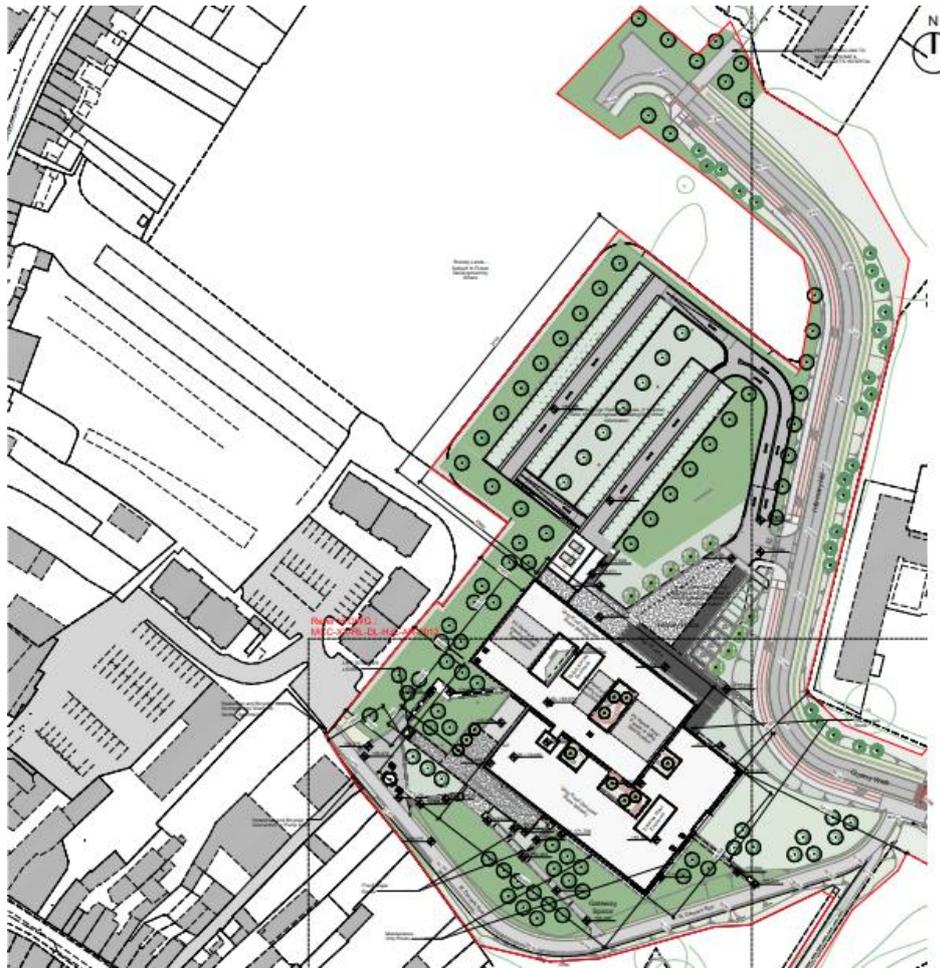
Civic Offices Layout Plan (Source: HJL Dwg Ref. MCC-XX-RL-DR-HJL-AR-0011_PROPOSED SITE LAYOUT PLAN (2 OF 3))
